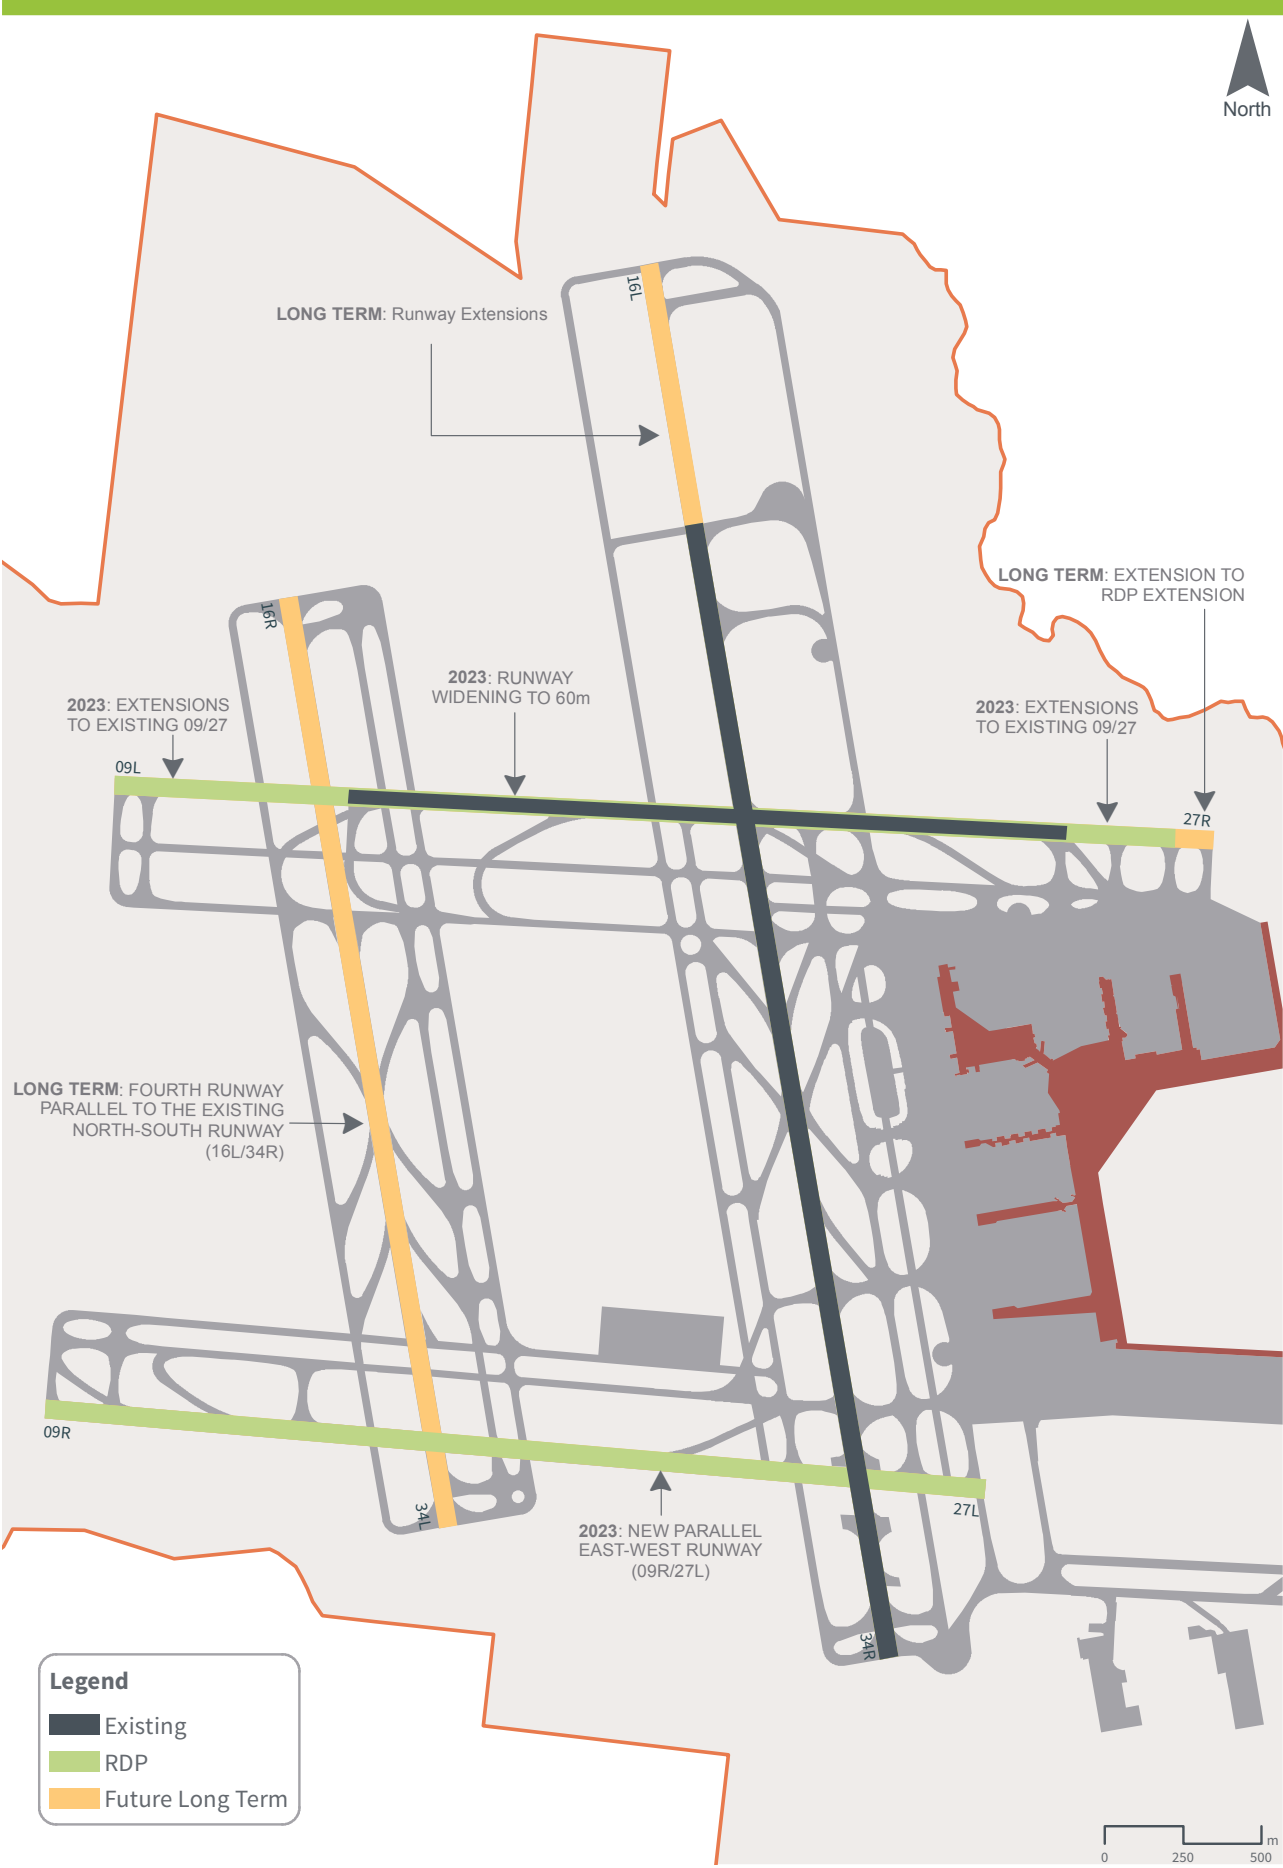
Long-term runway layout concept plan for Melbourne Airport
